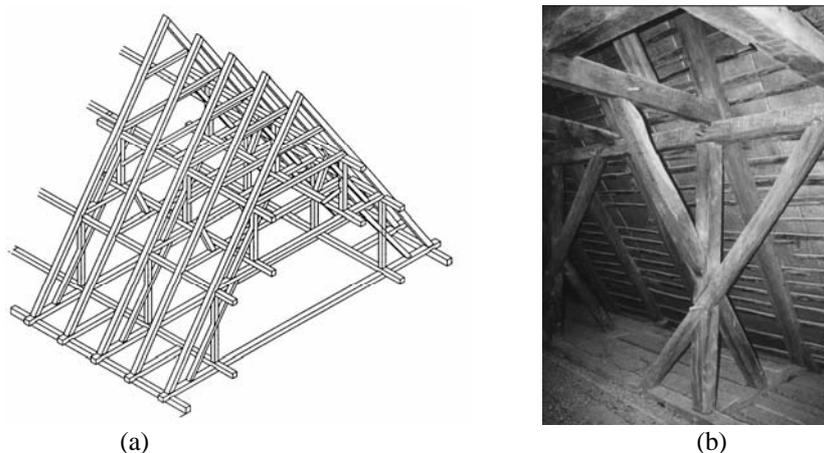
Gothic roof structure on common rafters and tie-beams with collar beams
